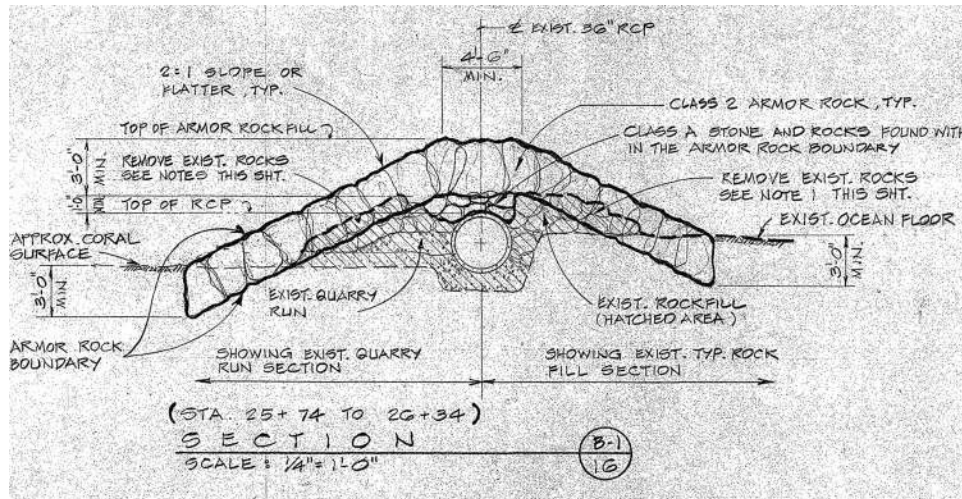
Typical section of ballasted sections from 1986 extension and repair.
